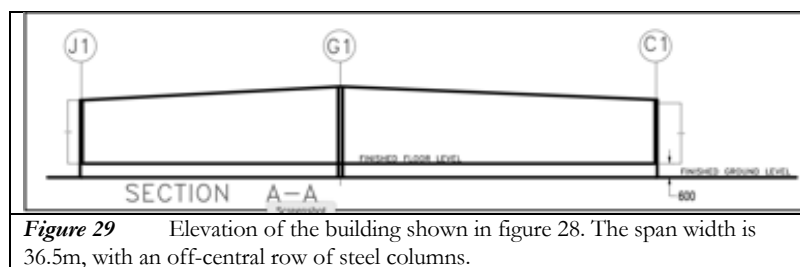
Elevation of the building shown in figure 28. The span width is 36.5m, with an off-central row of steel columns.
